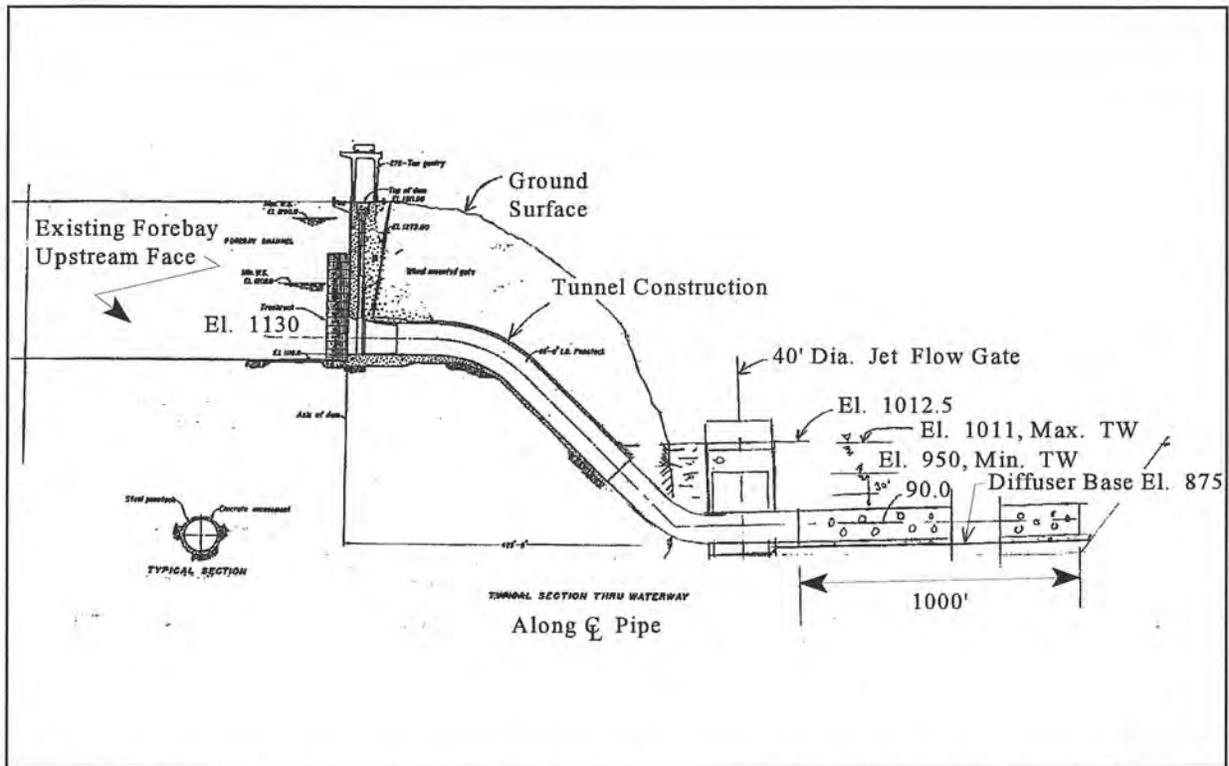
Section along the centerline of the pipe through the forebay dam alternative (No.3). (fn:alter#3-2.wpg)
